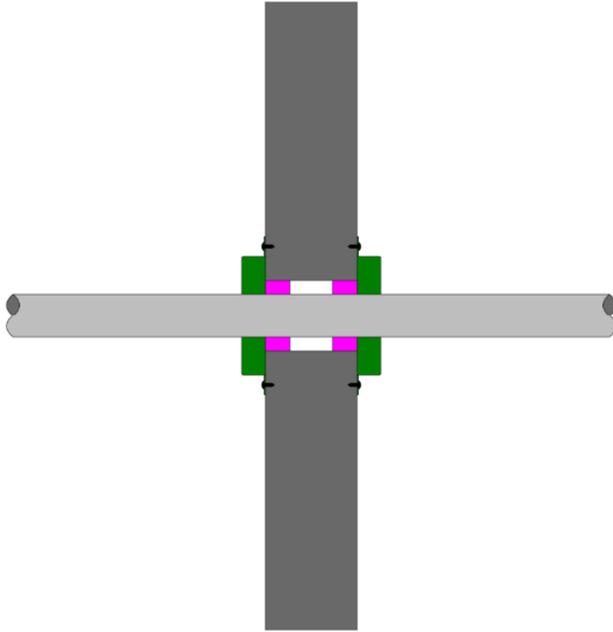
Typical installation of oversized BOSS MaxiCollar™ in walls
